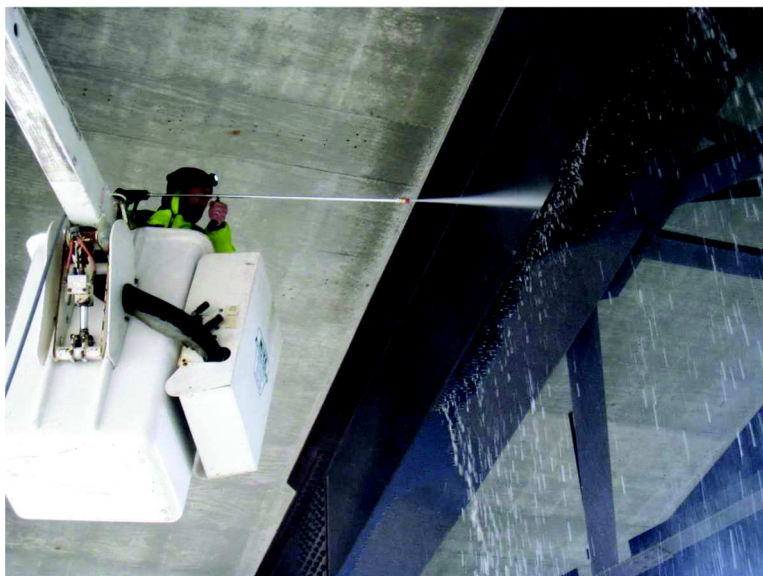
Steel bridge superstructure washing (Crampton et al., 2013)
